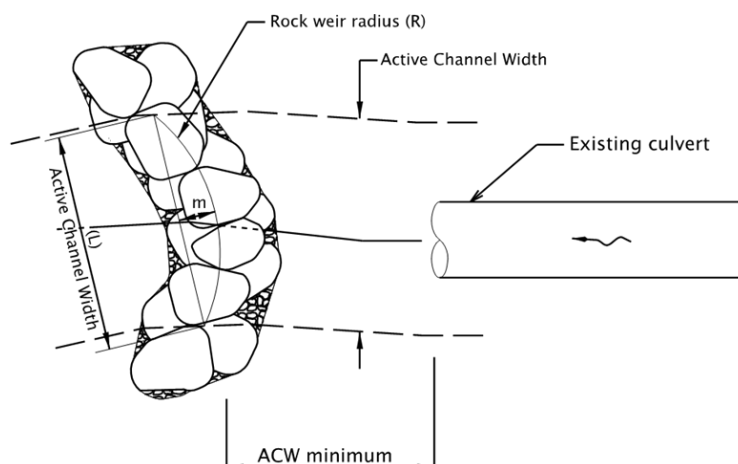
Design diagram of boulder weir and roughened channel to be installed below the perched culvert.
